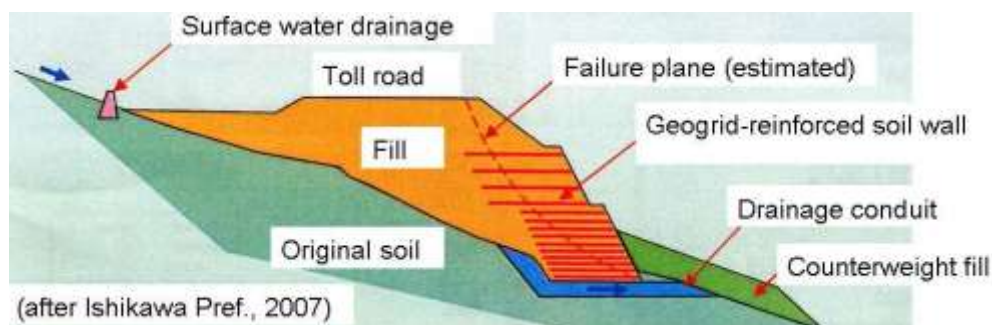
Schematic diagram showing reconstruction to GRS RWs of embankments damaged by the 2007 Noto hanto Earthquake (Koseki et al., 2007)
